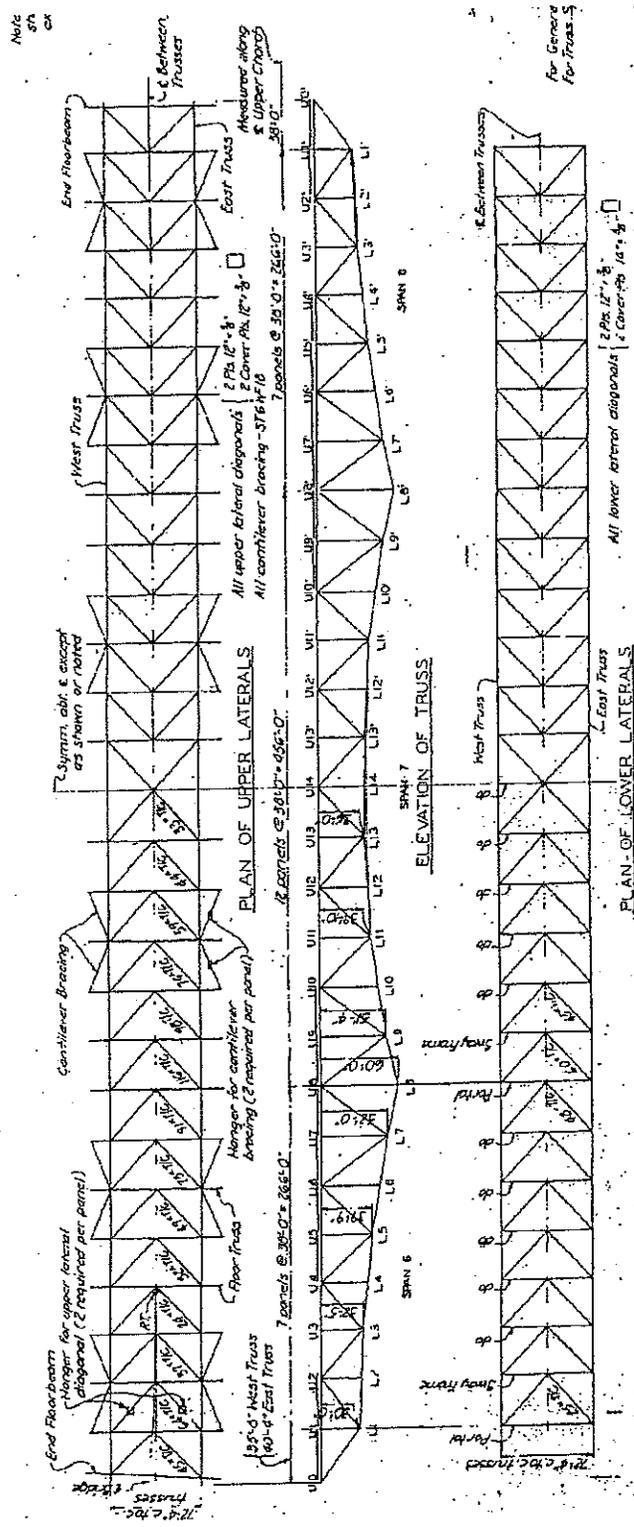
Deck Truss Framing Plan and Elevation from Original Contract Plans
